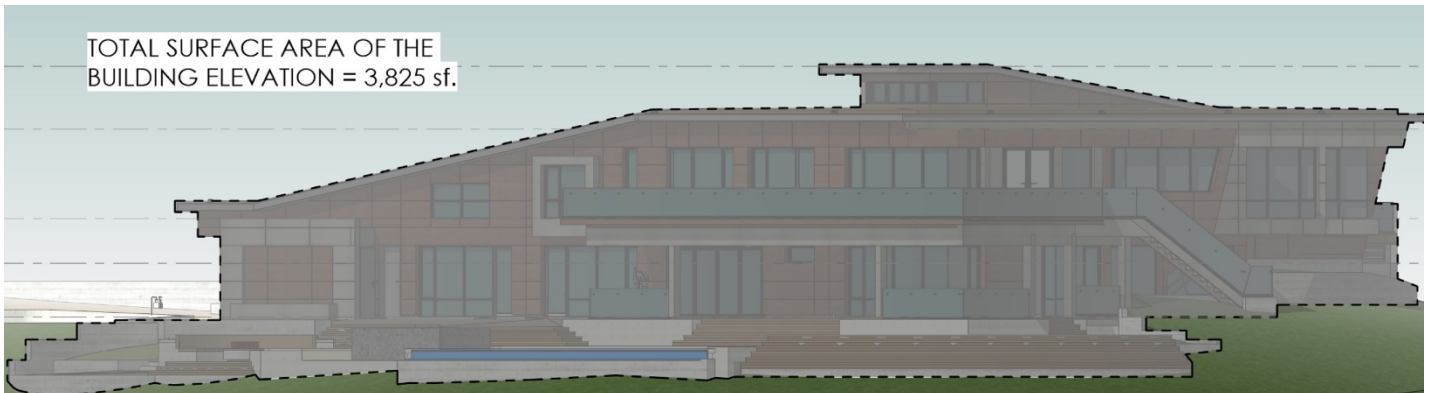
Elevation area (including all site elements) towards Selinda way/ L.G. Almaden Blvd. Viewing area
